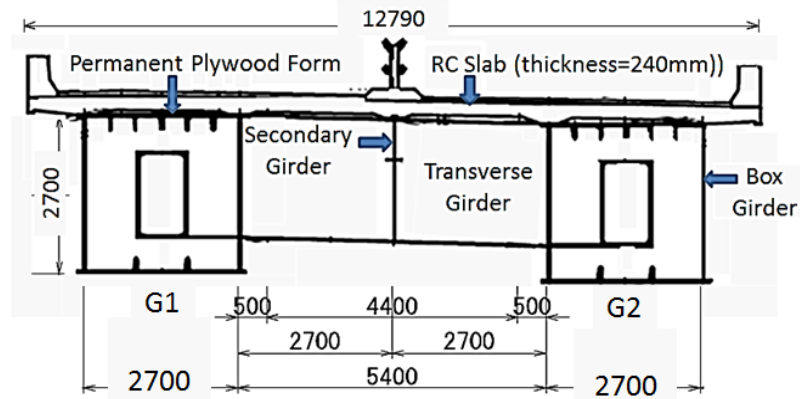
(a) Cross section of Shinkesen Ohashi deck girder bridge
